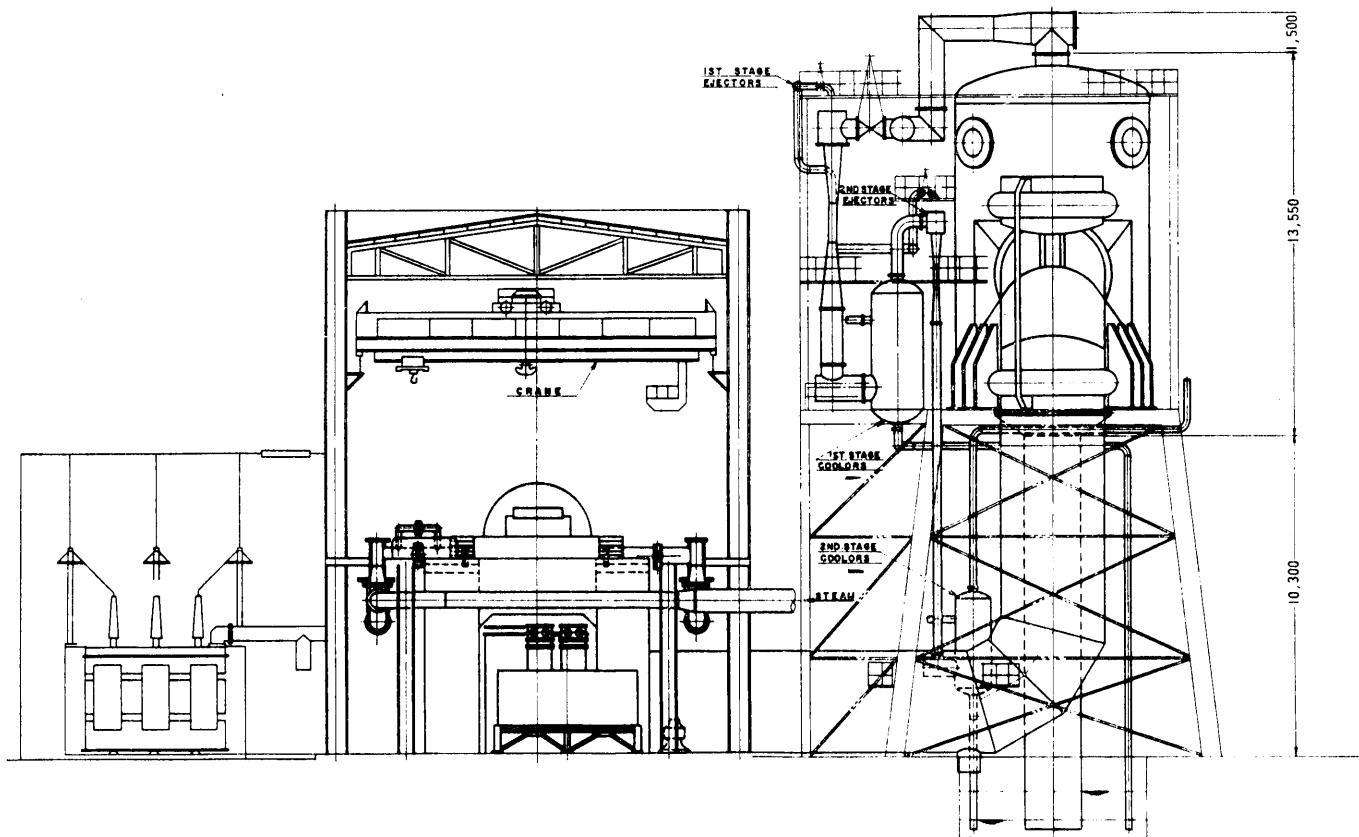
General arrangement of Cerro Prieto (Section).
